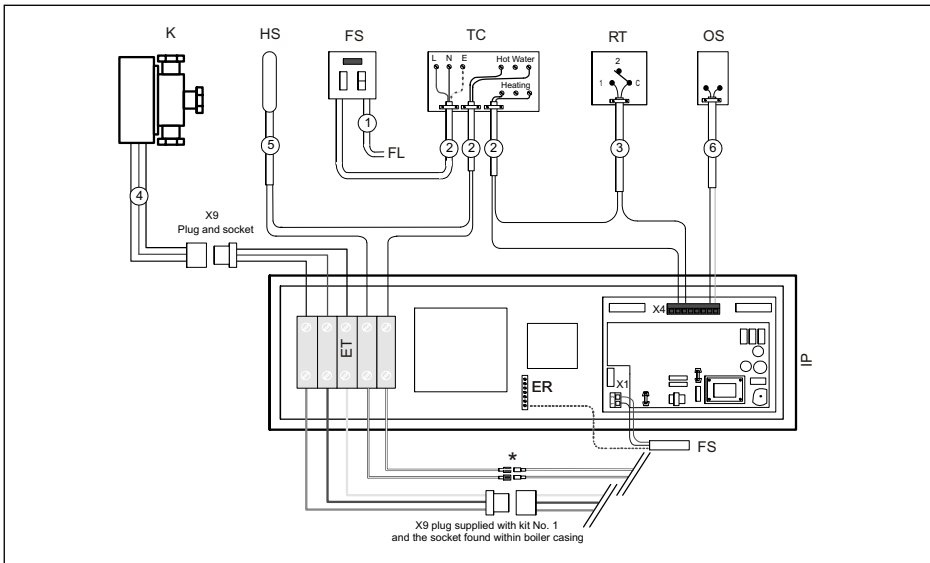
Electrical drawing Selecta system boiler (use in conjunction with hydraulical drawing Fig. 15)
